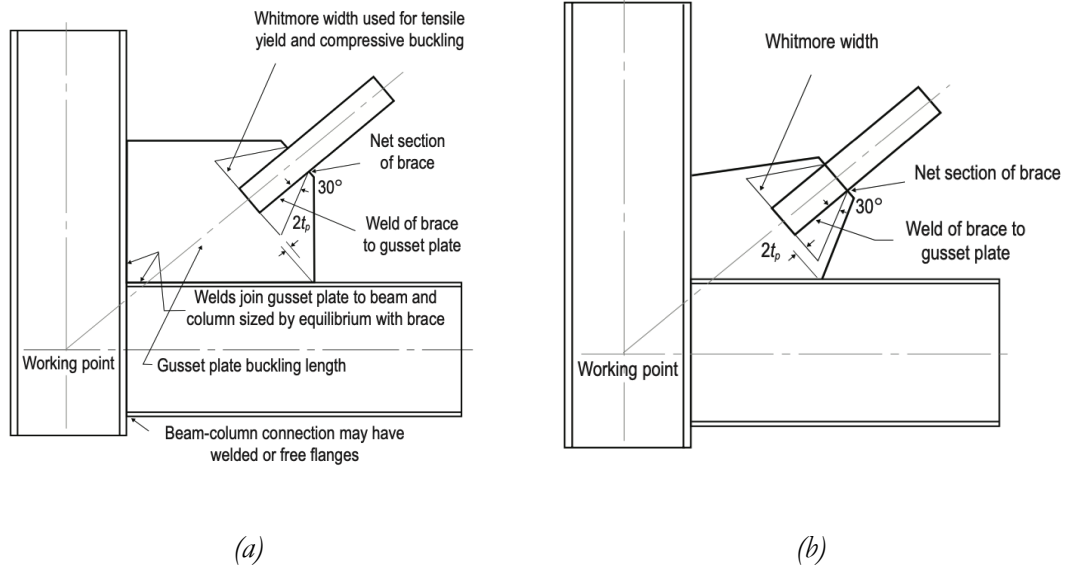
Gusset plate connection design: (a) Rectangular gusset plate; (b) Tapered gusset plate [44].
